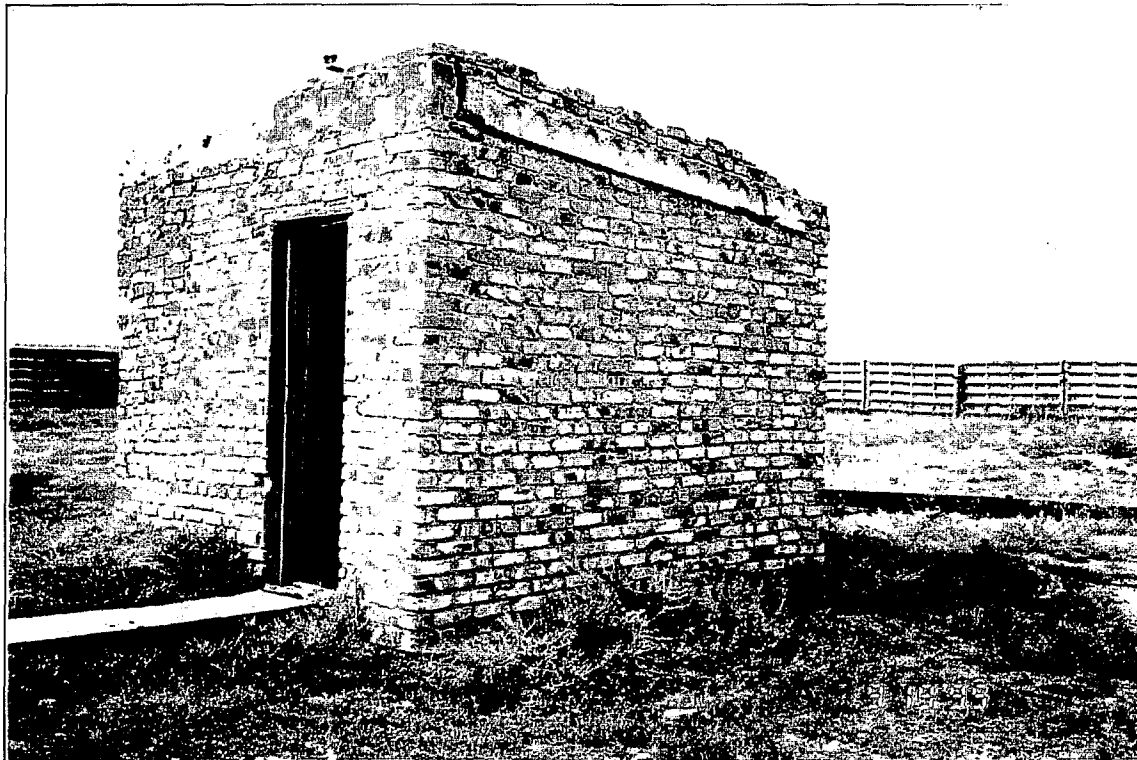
Pumphouse construction of brick and mortar, typical of Wells 13 to 17 and 21 to 22. Constructed from 1985 to 1987.
